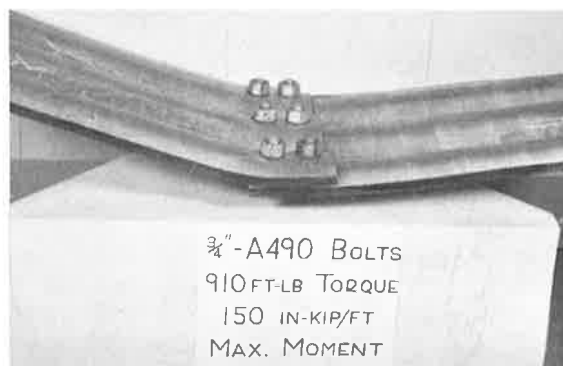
Typical beam test specimen after testing showing plastic bending failure of plate material.
